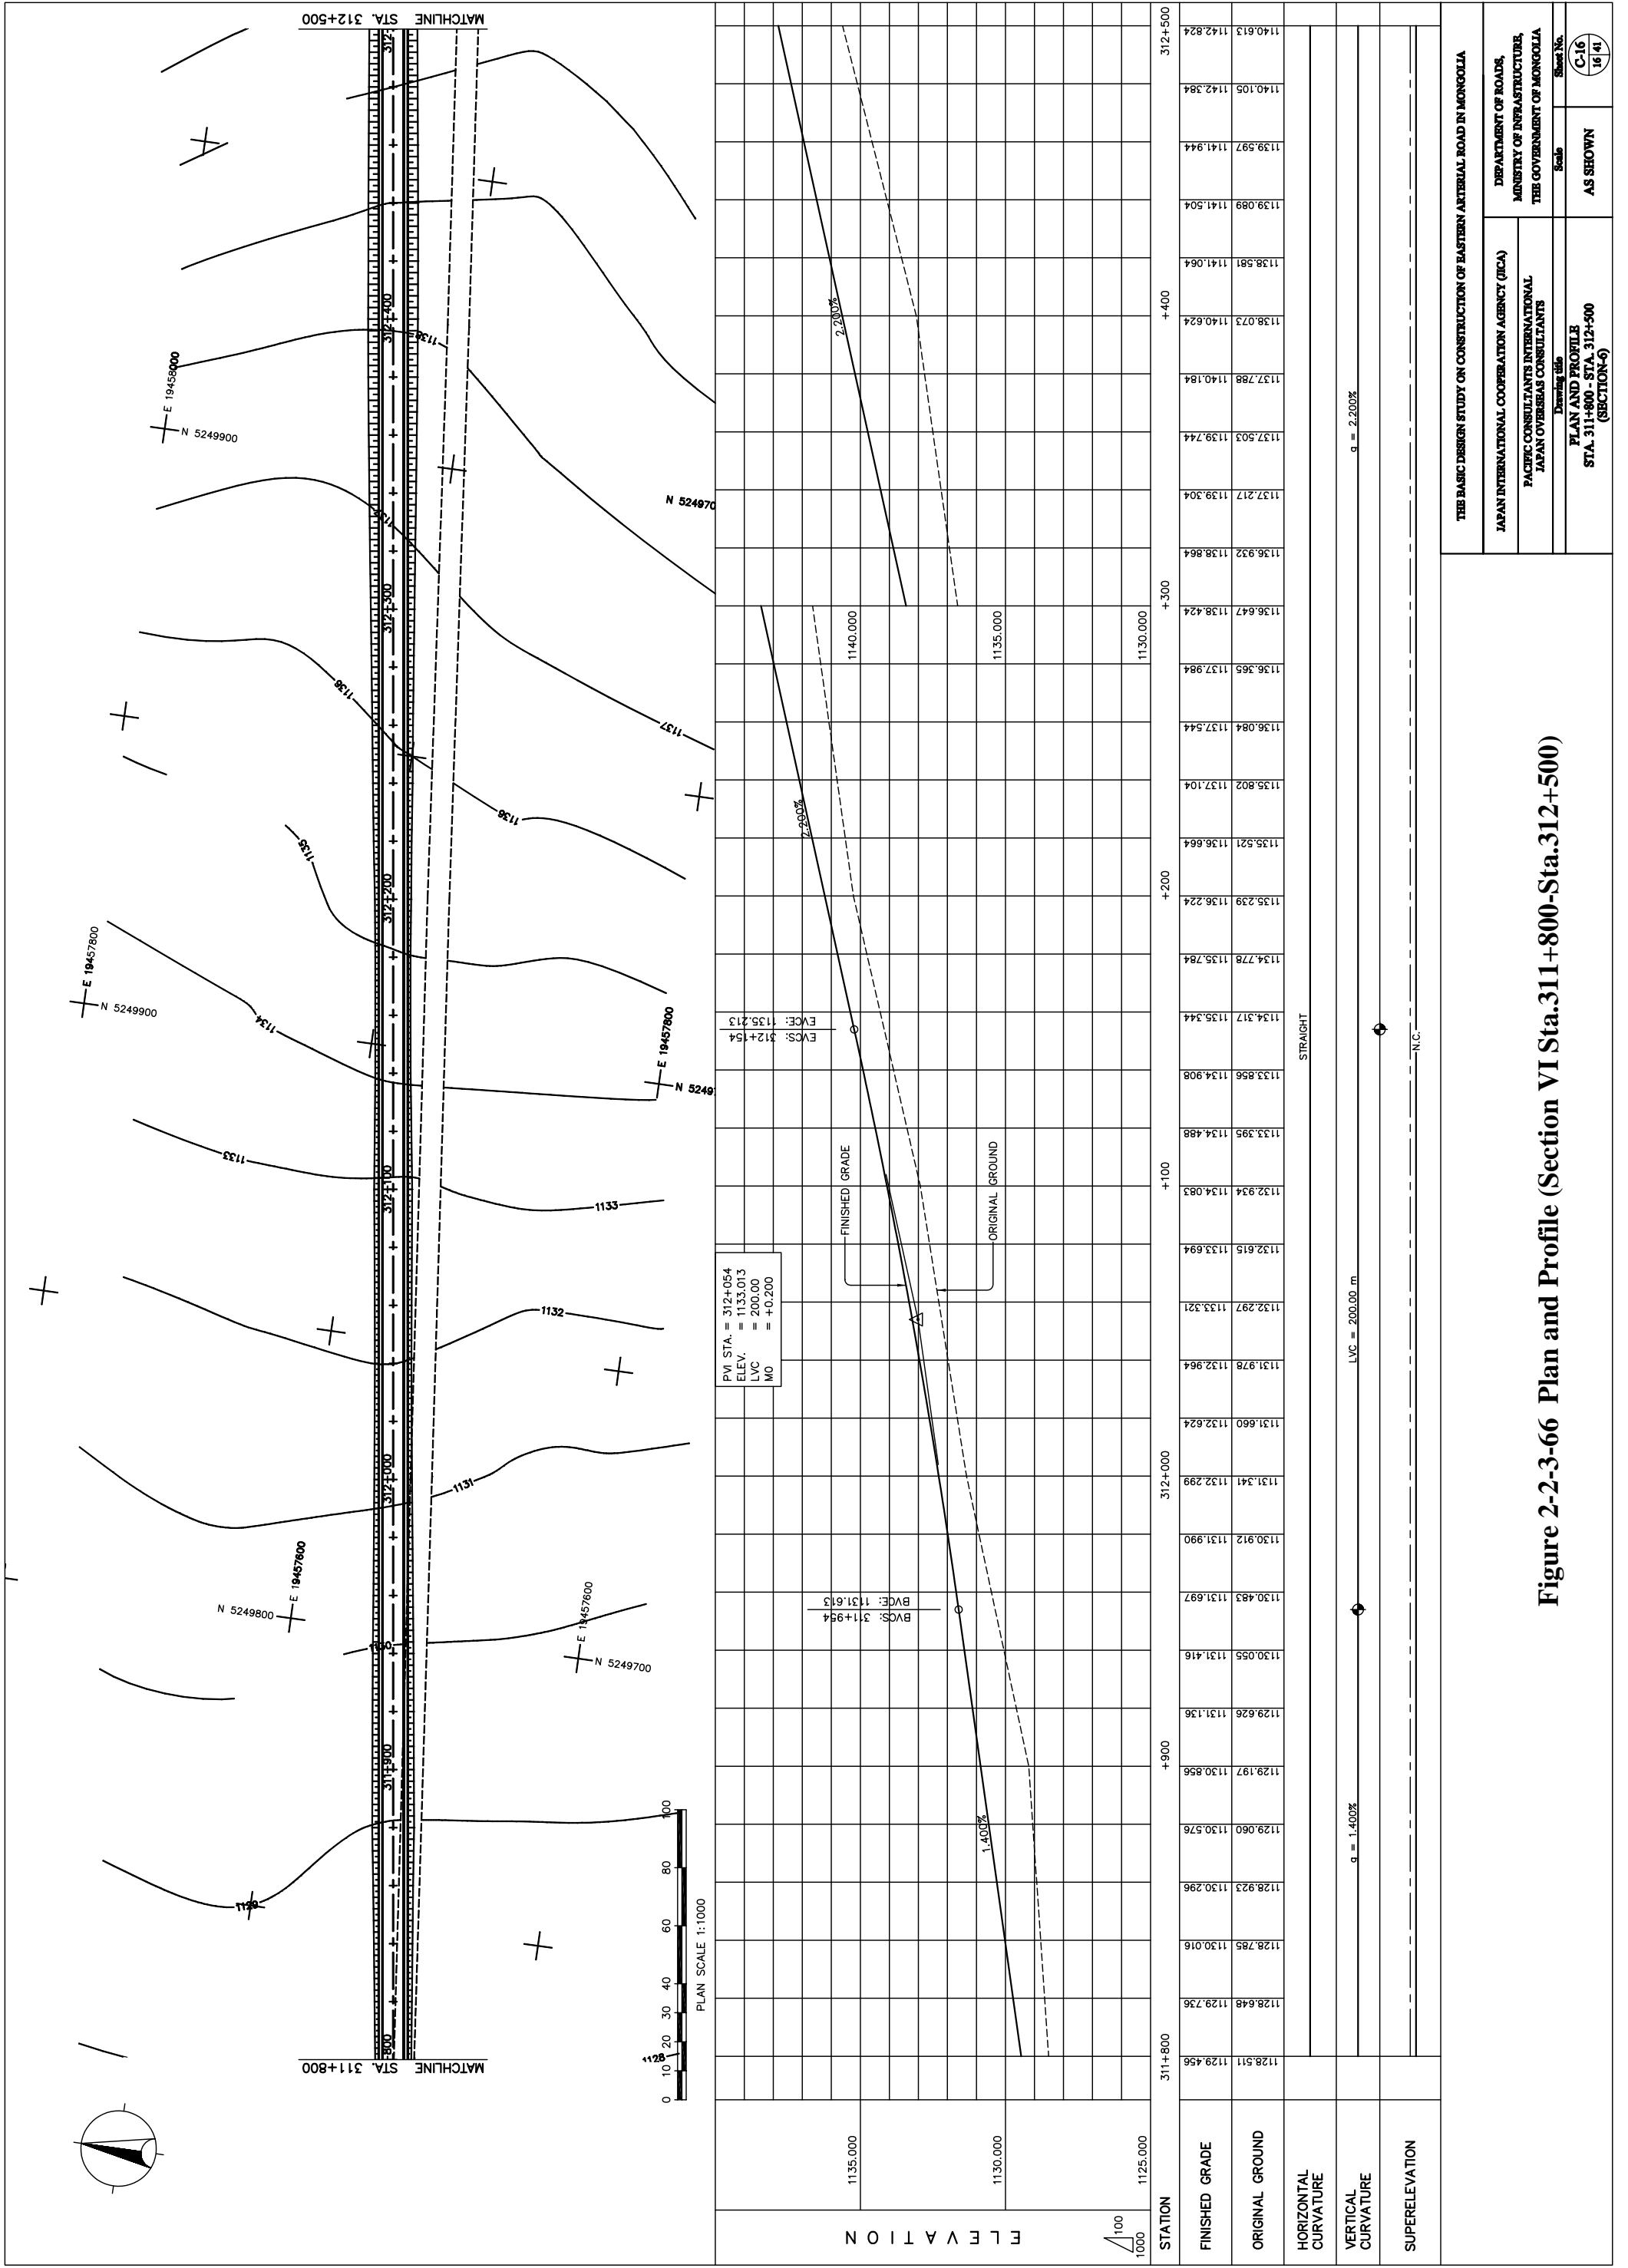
Plan and Profile (Section VI Sta.311+800-312+500)
